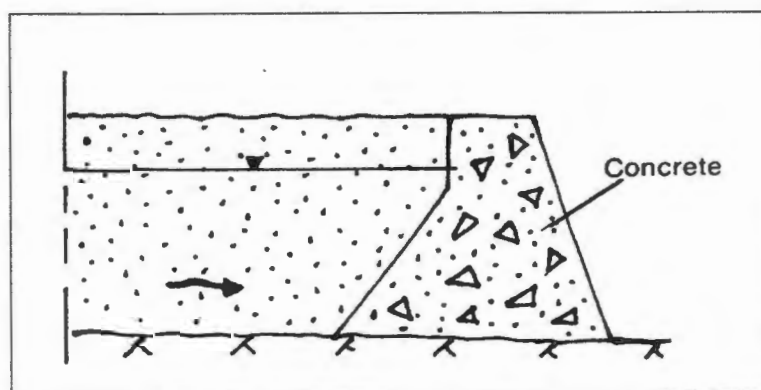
Concrete sand-storage dam (from Nilsson, 1988)
